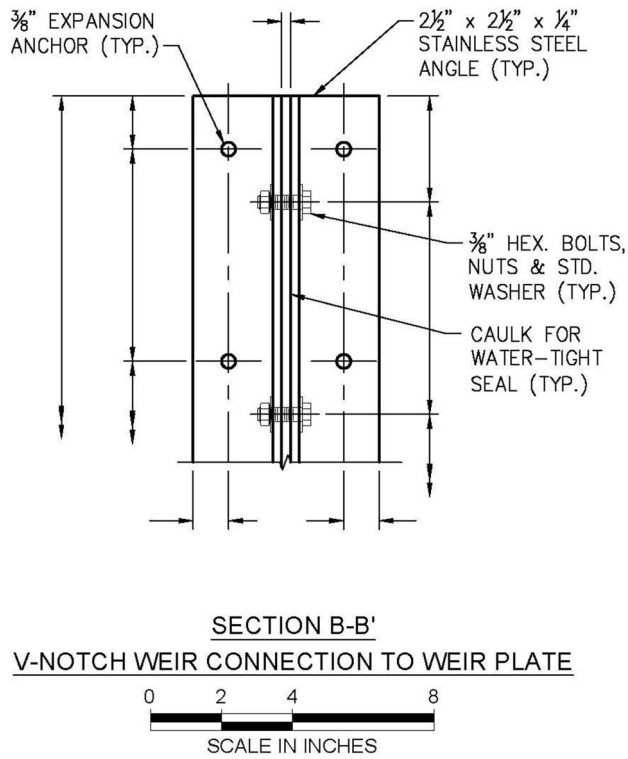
S-20. Dimensioning of V-Notch Connection to Weir Plate
